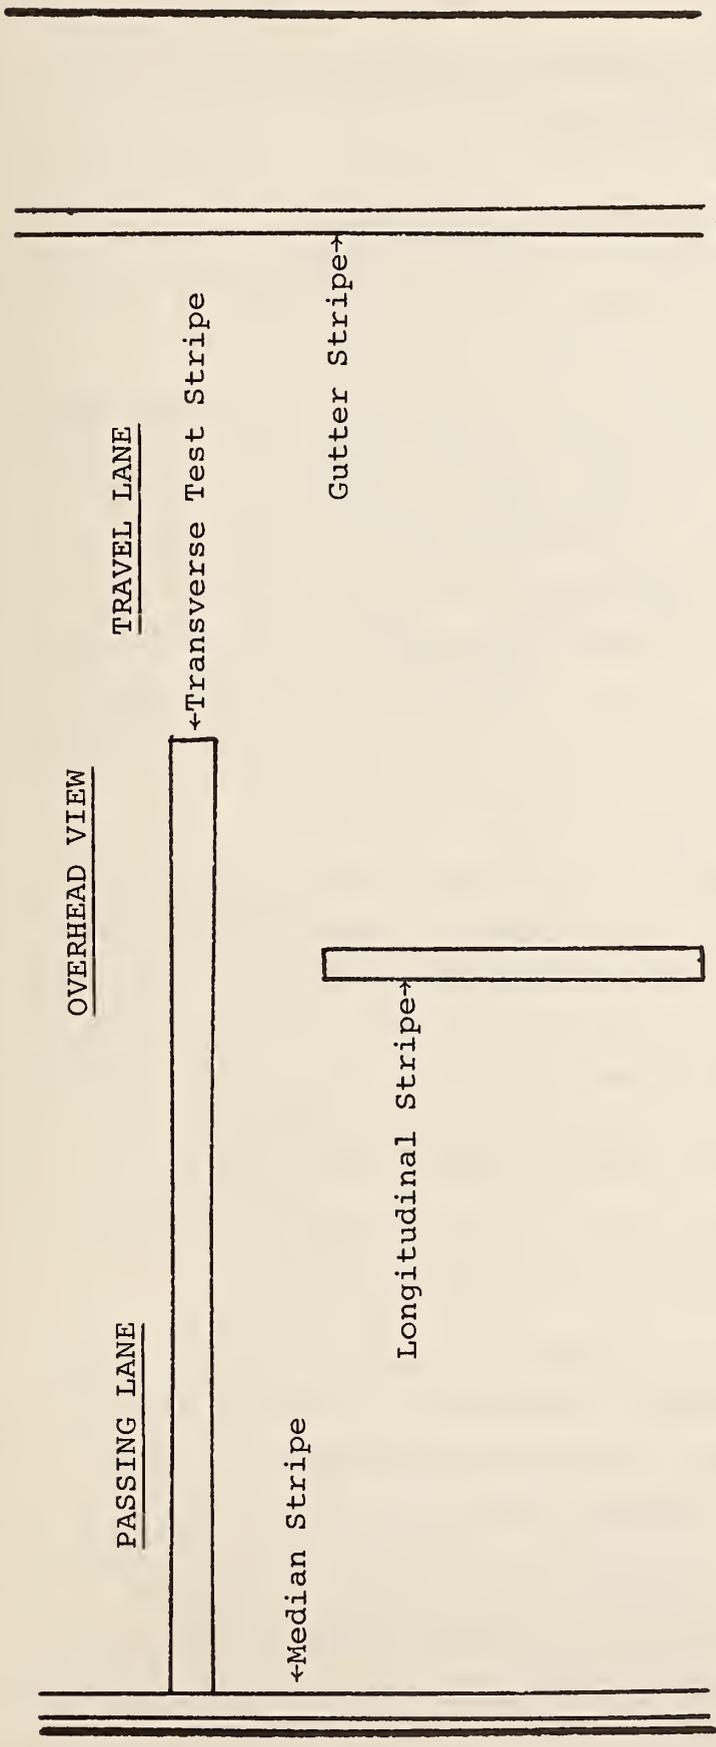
ROAD AND STRIPE WEAR ON ROUTE 1
